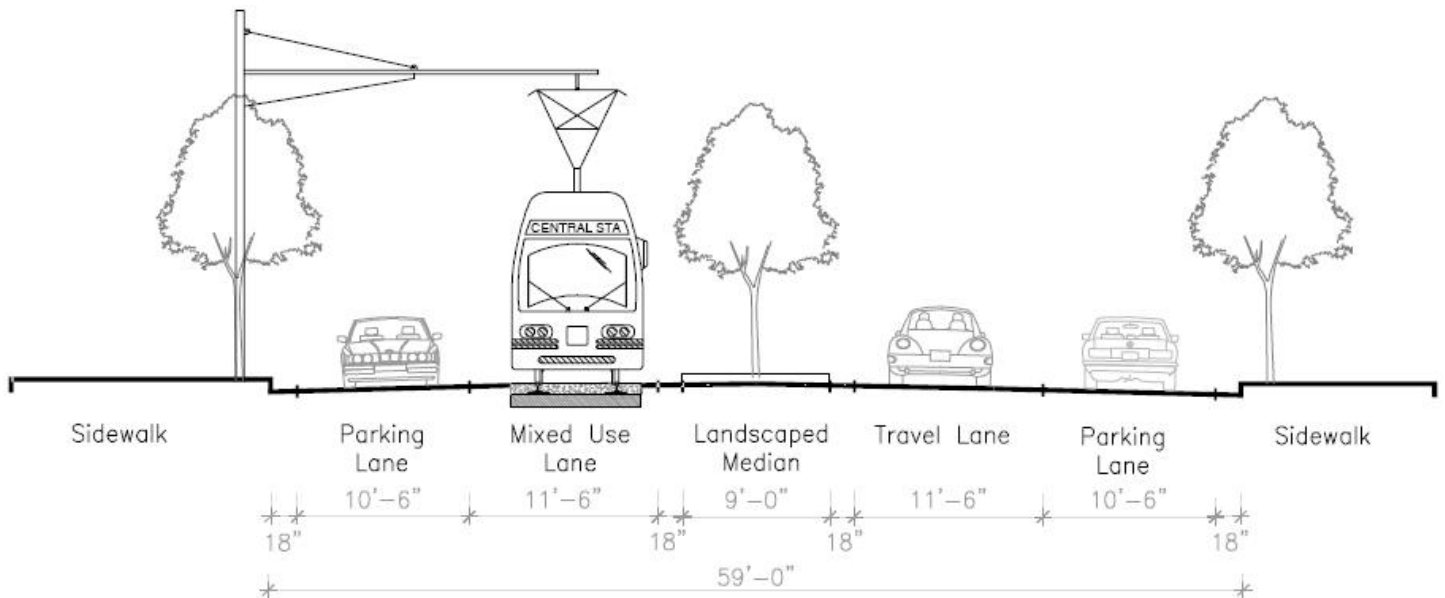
Proposed Typical Section on Monroe Avenue south of Pearl Street
